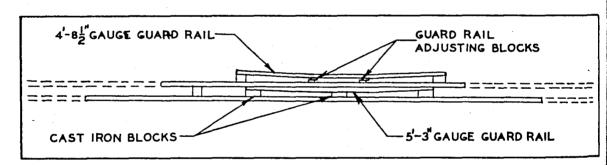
THE SPECIAL DOUBLE GUARD RAIL ASSEMBLY
